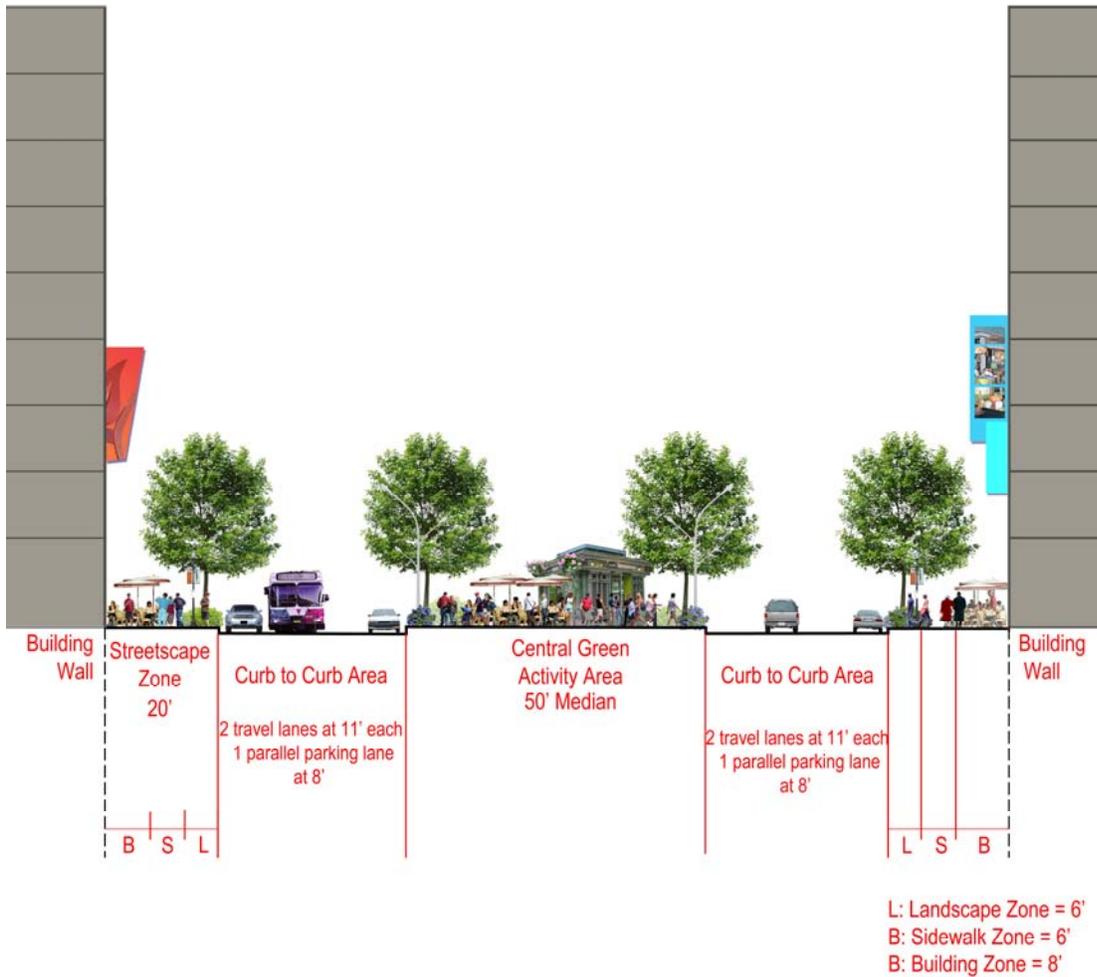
SOUTH JEFFERSON STREET STREETSCAPE SECTION
